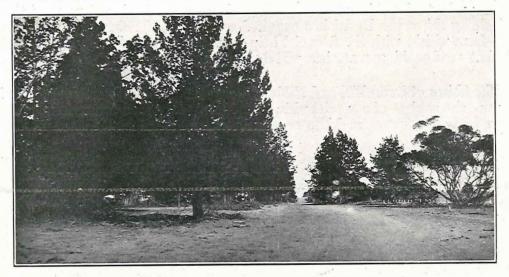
Showing good road on natural surface at Walpeup, Ouyen-Pinnaroo Road.
